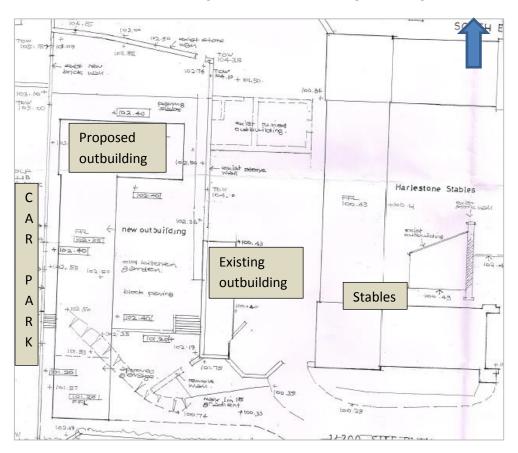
Extract of plans for the new outbuilding. The wall on the left is the current high car park wall in Fig 3. The new outbuilding will stand on the scrub shown in Fig 4.
